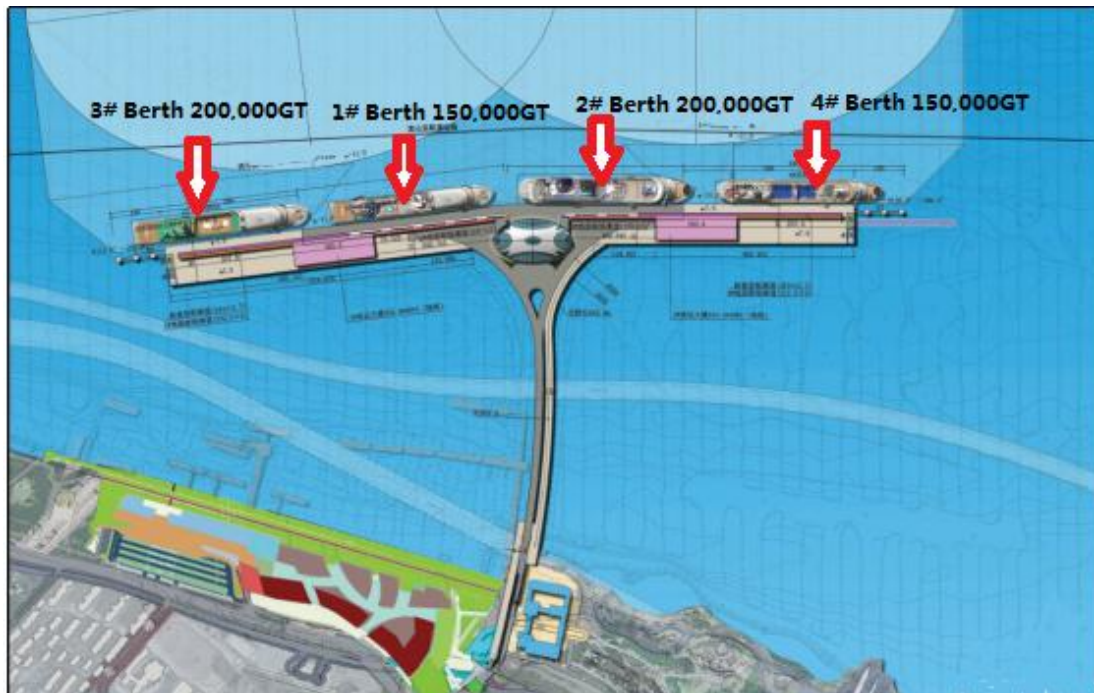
WSKICT Berth Layout Plan After the Extension Project
